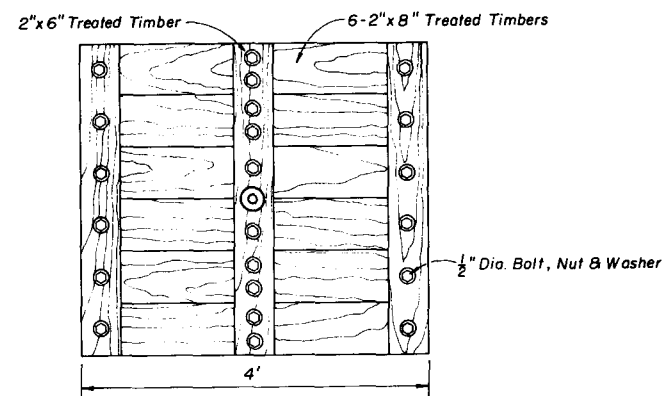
### DETAIL OF TRACTOR CROSSING, TYPE "B"
